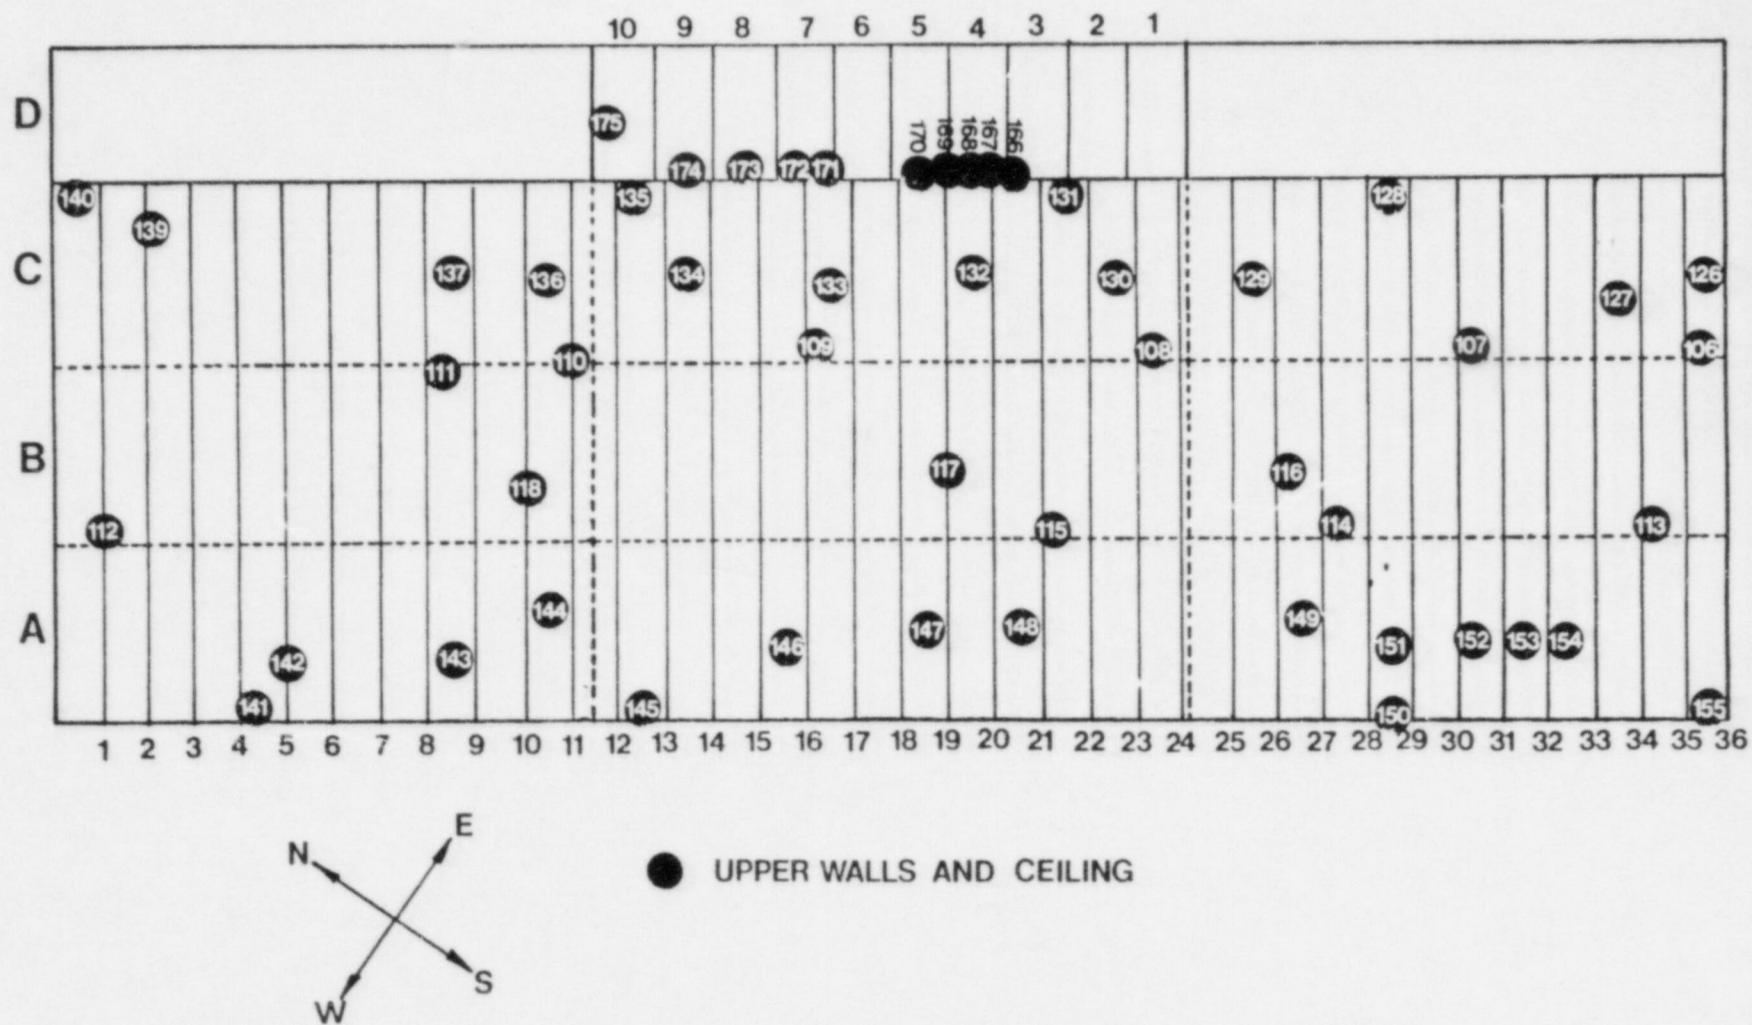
B: Floor Plan of the Alloy Building Indicating Locations of Measurements and Smears (Upper Walls and Ceiling)
